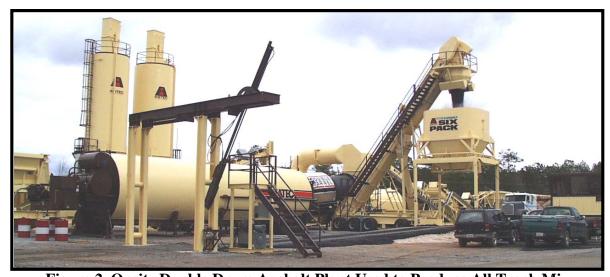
Onsite Double Drum Asphalt Plant Used to Produce All Track Mix
